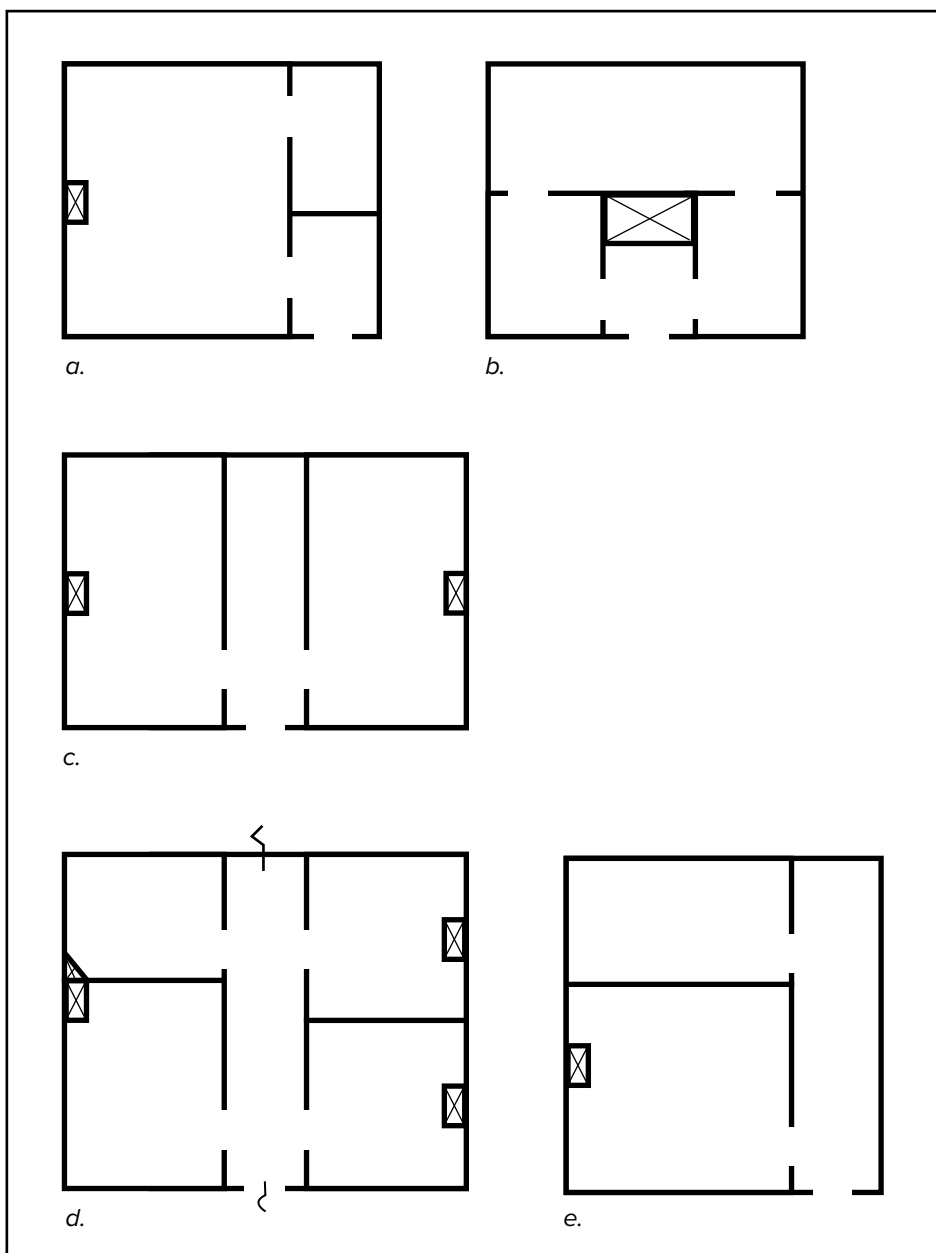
Common New England house plans: *a.* story-and-a-half houses with one-room and side-lobby plan; *b.* story-and-a-half center-chimney houses with hall-parlor plan and center entry; *c.* story-and-a-half houses with hall-parlor and central passage plan; *d.* story-and-a-half houses with central passage plan one-and-a-half rooms deep; *e.* two-story side-passage house with one- and two-room plan. (Stairs are not shown.)
